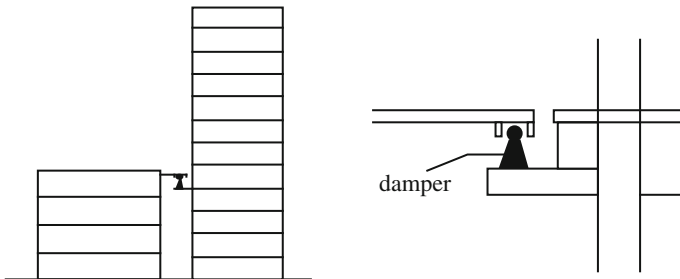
Buildings connected by link elements with dampers (after Kobori et al. 1988)
